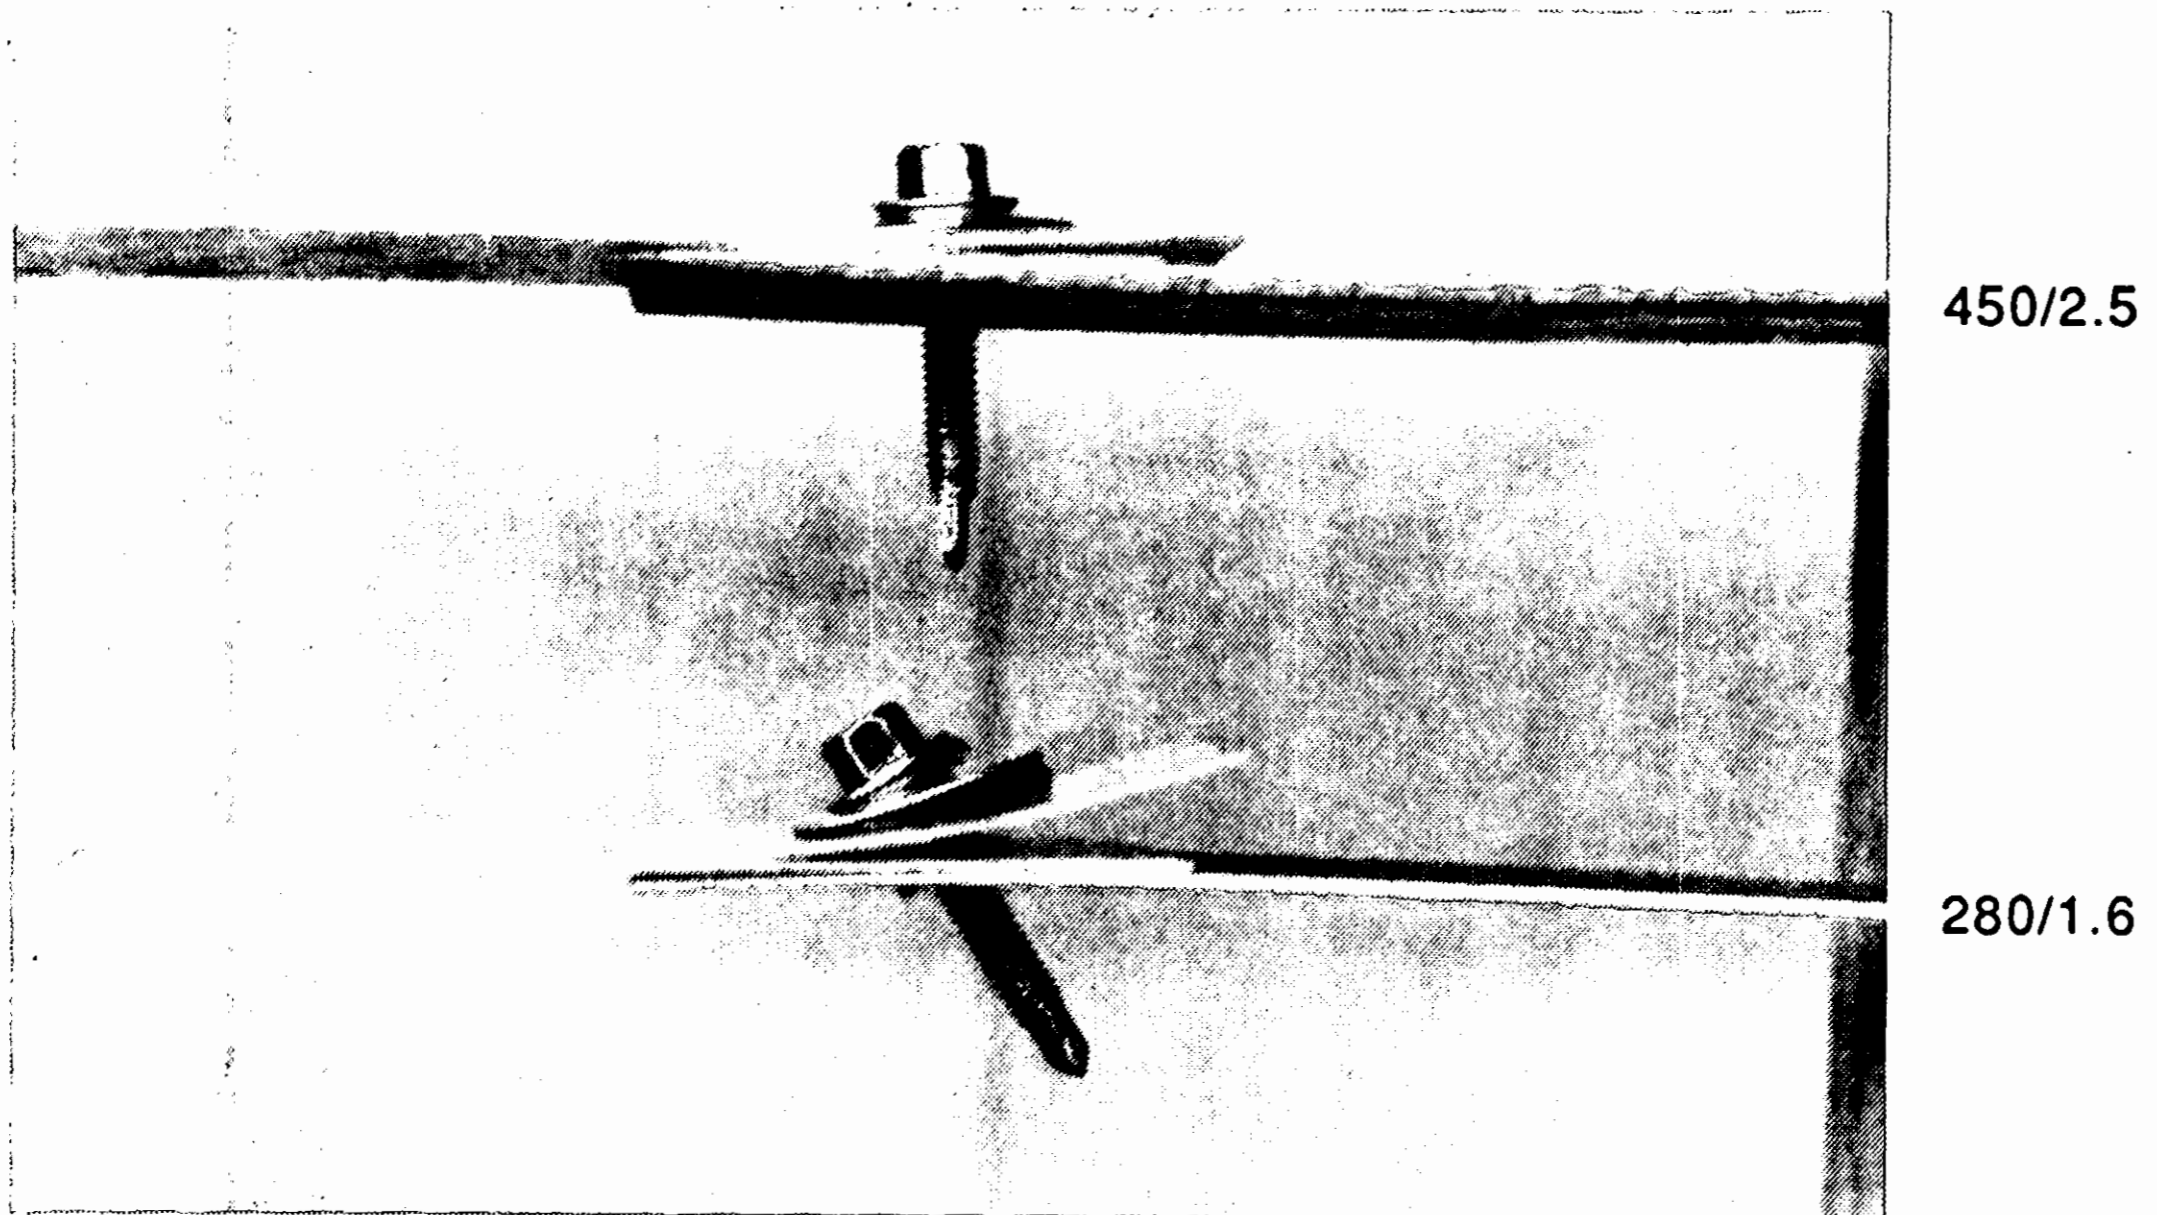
Sheet (0.40 mm)-to-purlin connections (12g emb) after pull-out tests.
